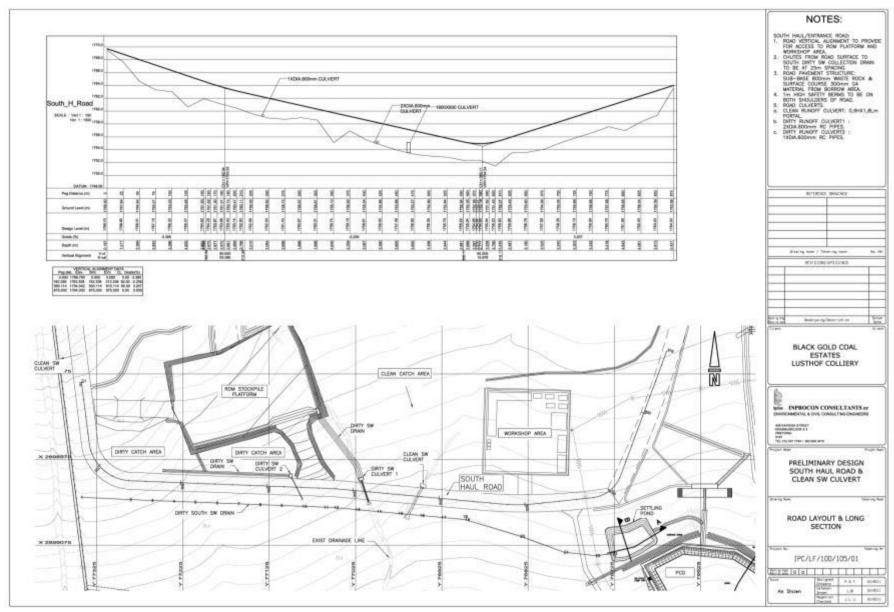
(a): Clean Water Culvert and South Haul Road - Road Layout and Long Section.
